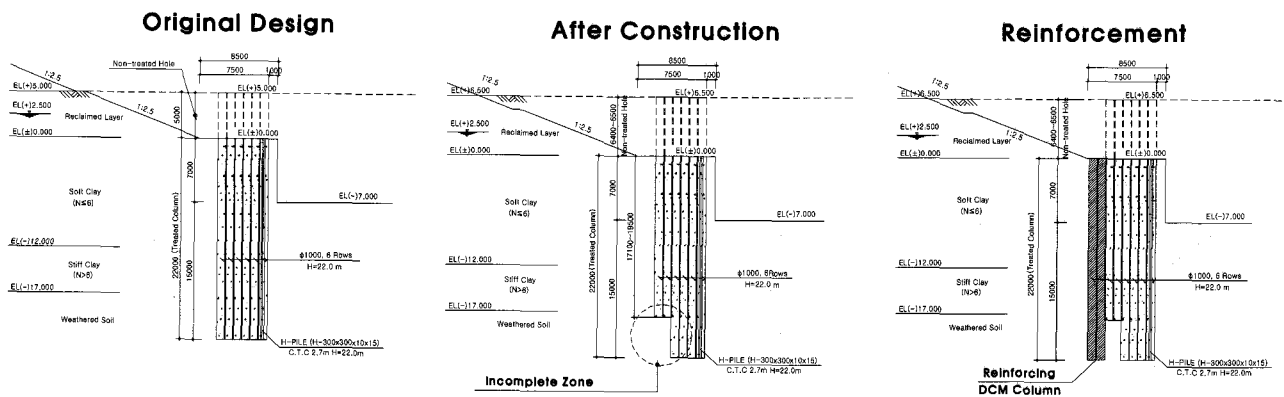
Cross sectional view of reinforcement in the stiff soil layer
